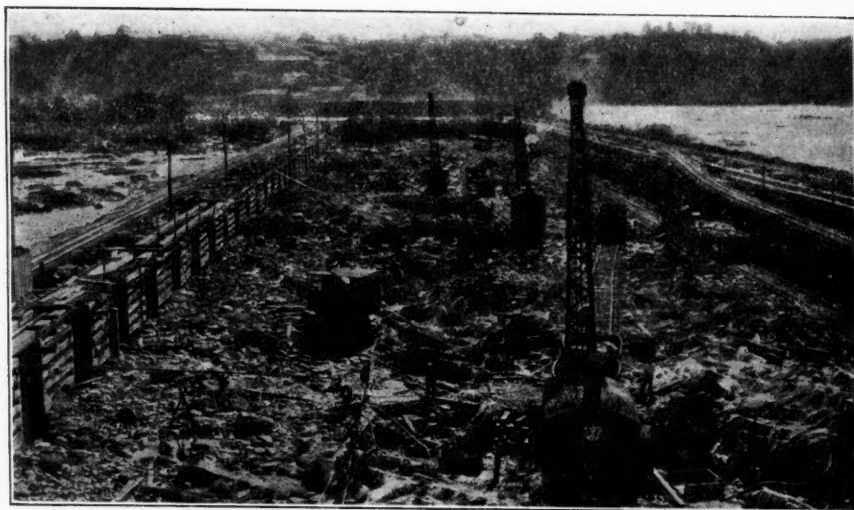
VIEW SHOWING TYPE OF CONSTRUCTION USED IN COFFER-DAM OF ALTERNATE CRIB AND STOP-LOG SECTIONS.
